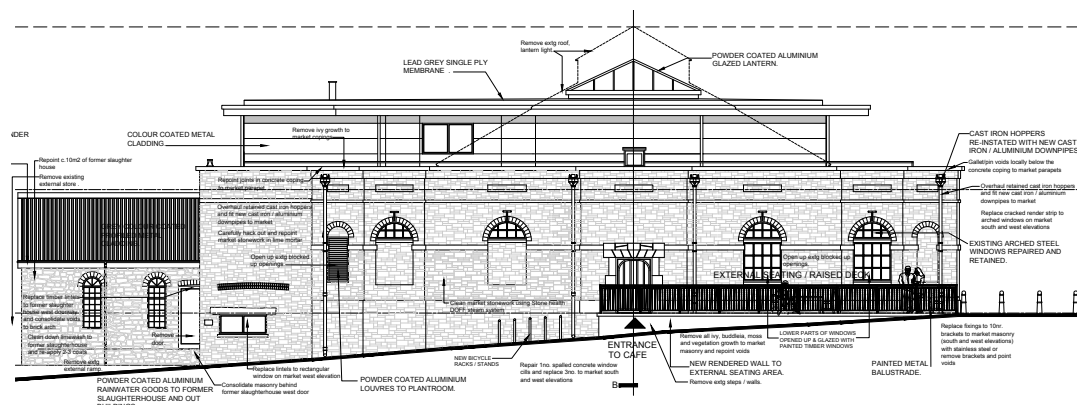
above: Consented north west elevation – source Pembroke Design Ltd
